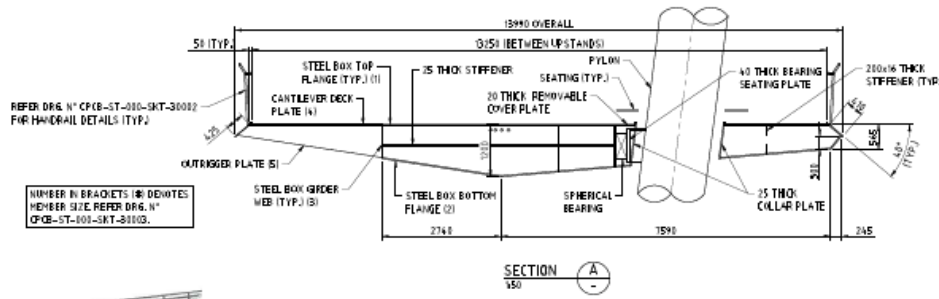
Typical Pylon Bridge Segment Interface – McCallum Park Pylon 2
